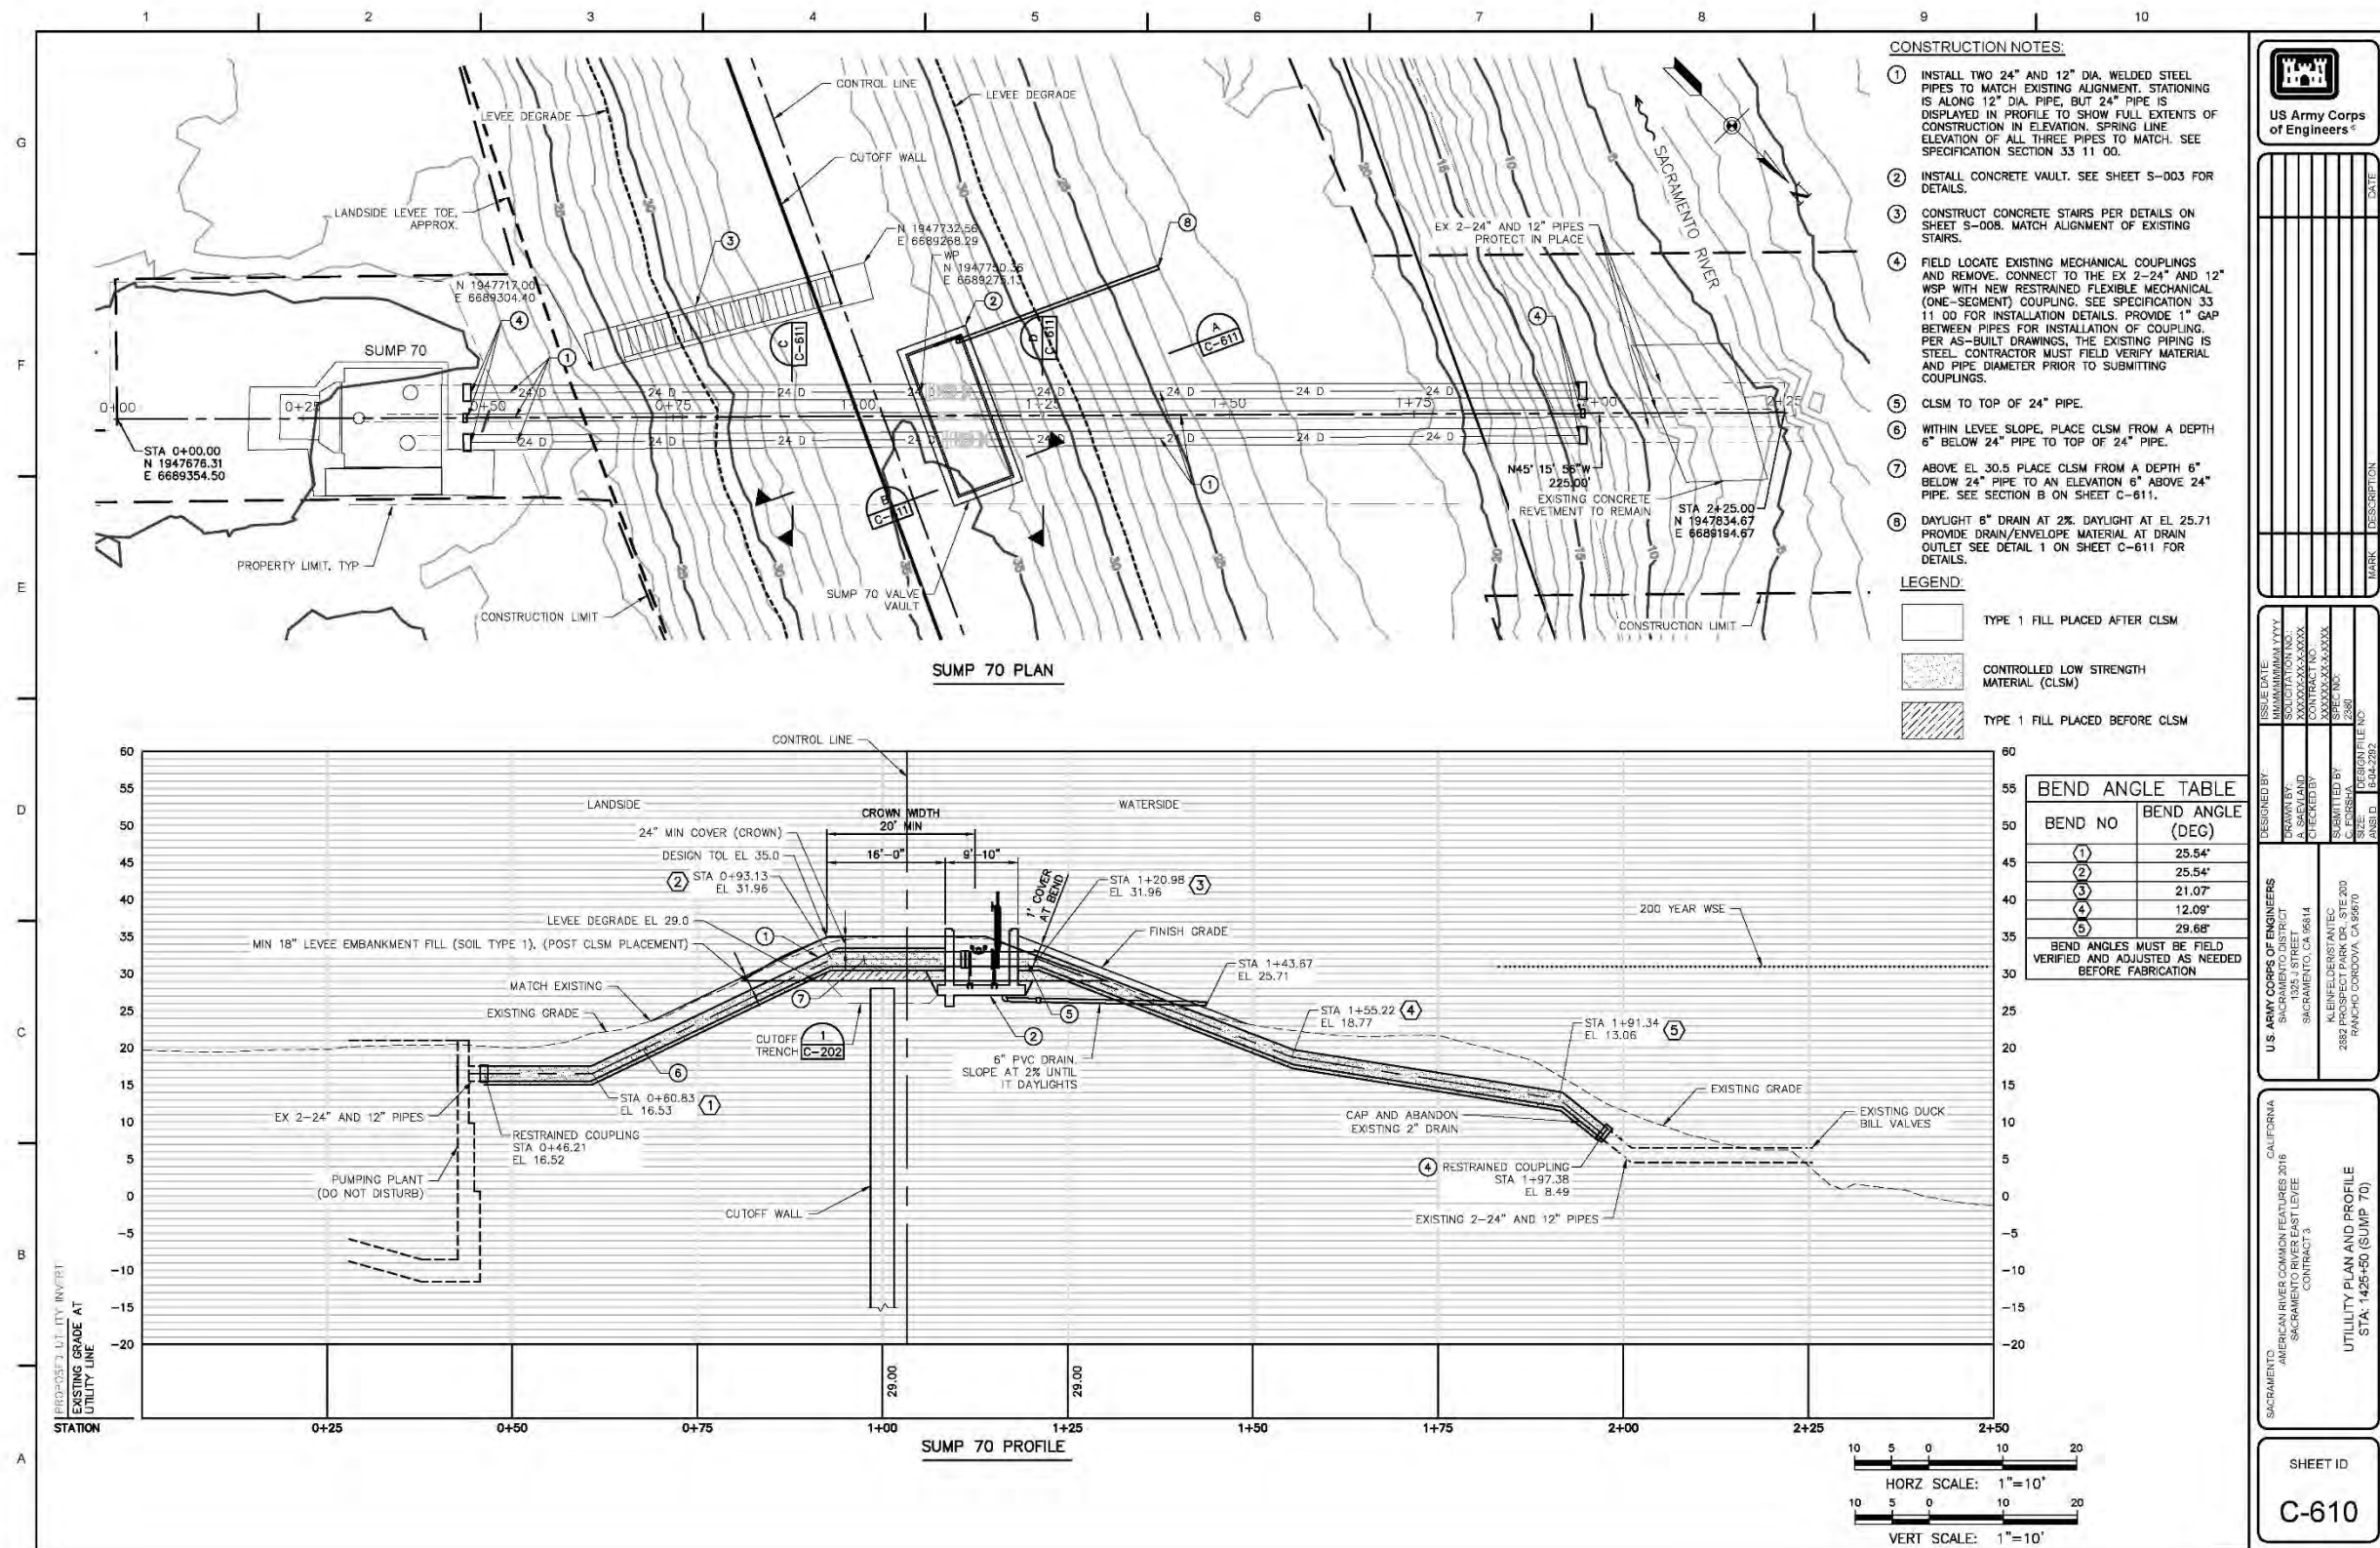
Plan view of the municipal pipe replacement at Sump 70.
